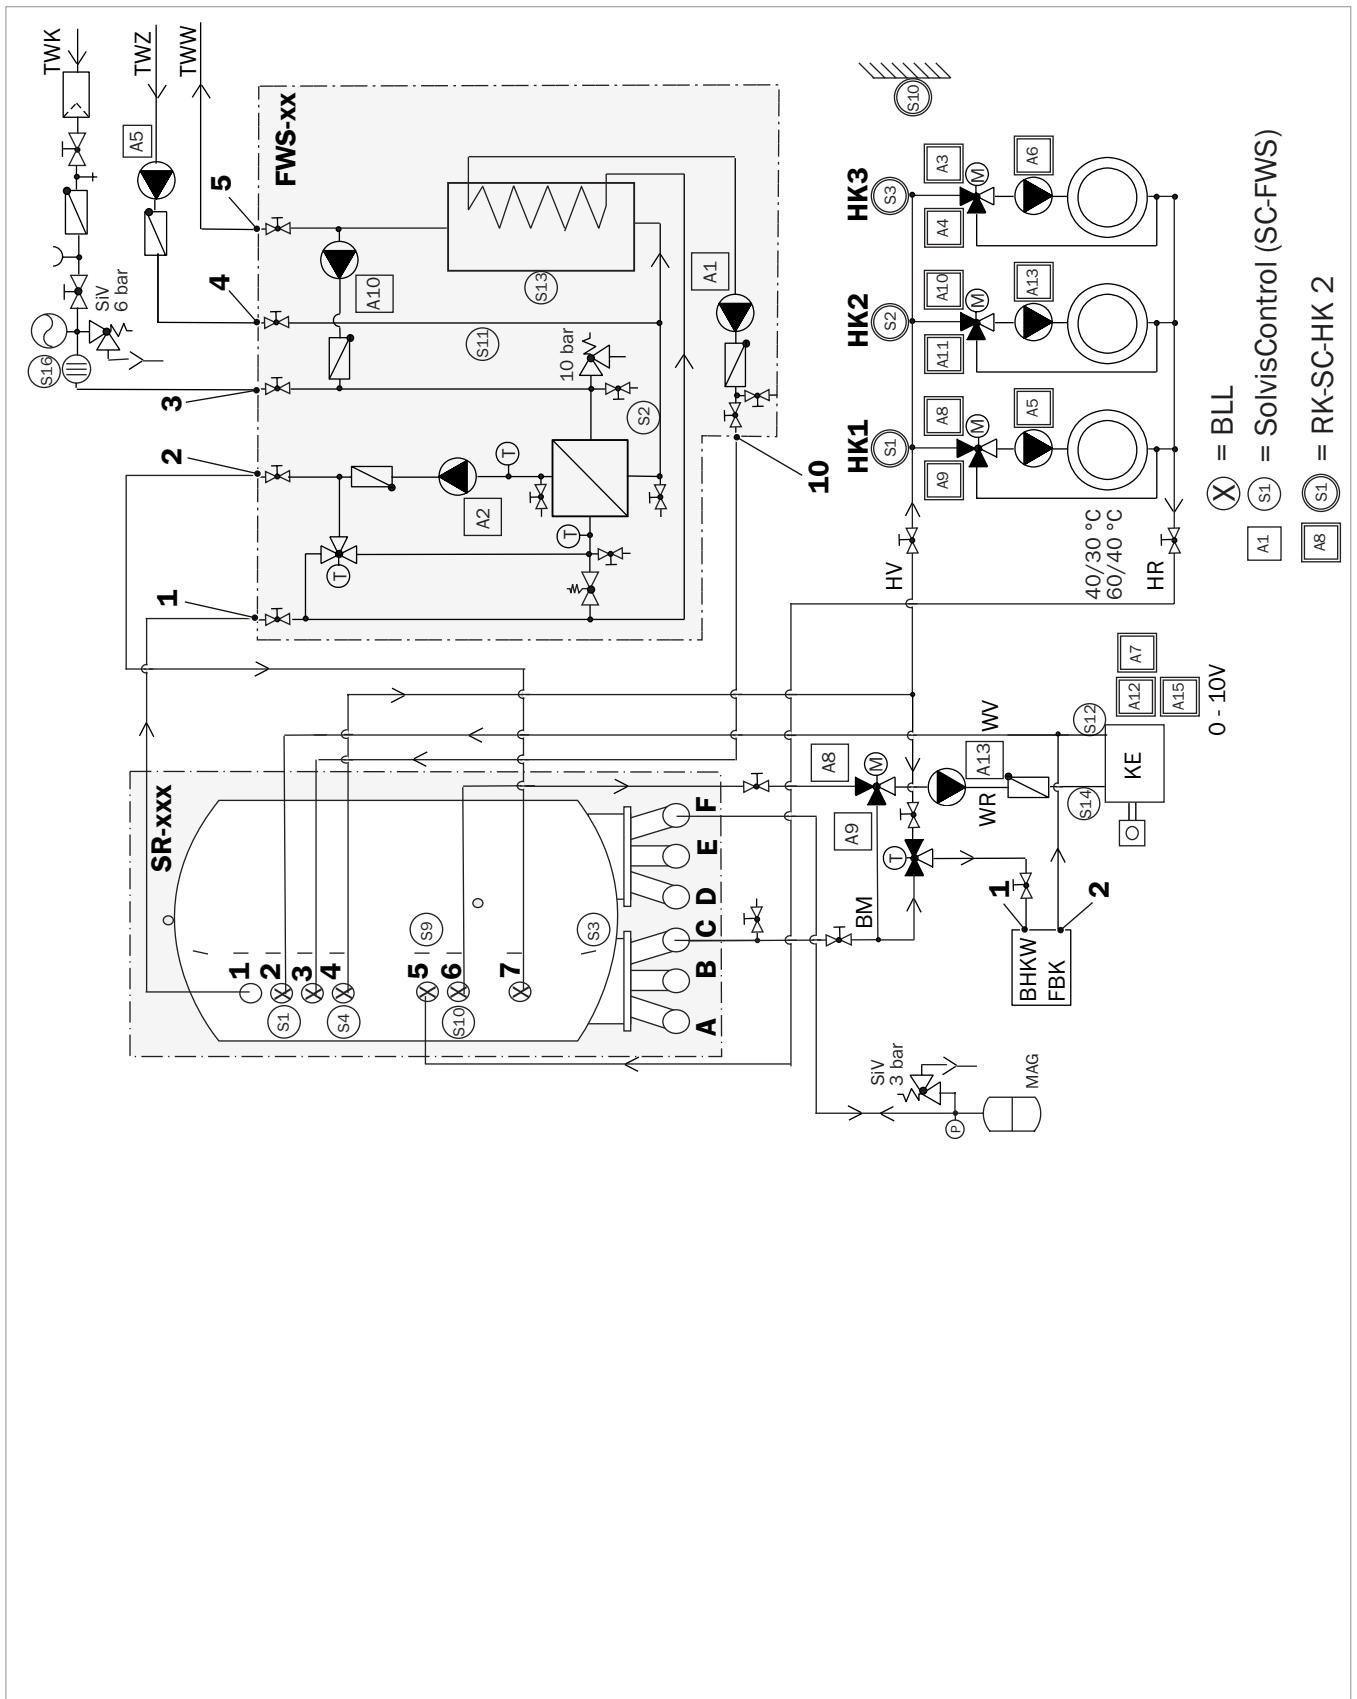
SolvisVital 2 with modulating gas or oil boiler, storage tank and BHKW or solid fuel boiler
